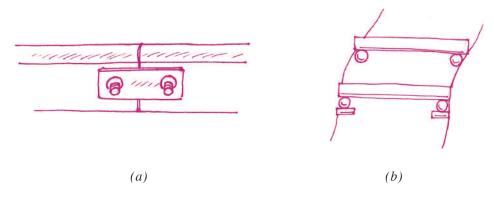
(a) Gap in railway tracks (b) Girders in iron bridges placed on rollers
